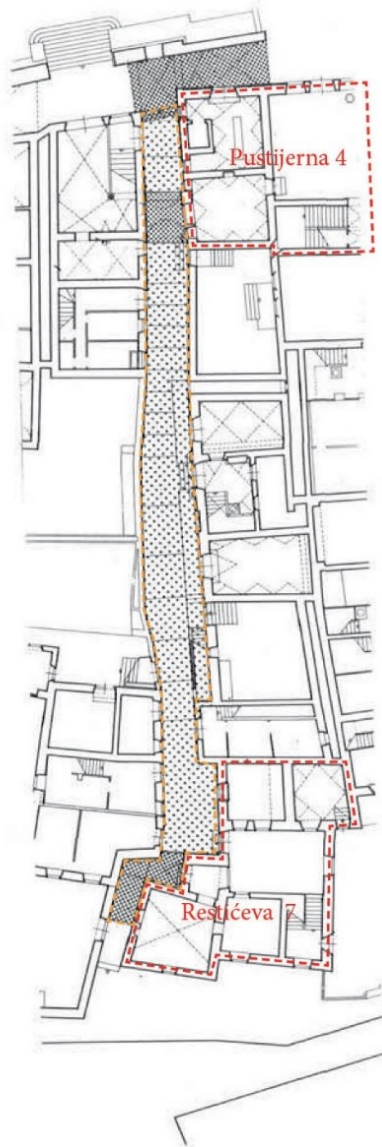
The ground floor of the rows of houses in Restićeva Street in Dubrovnik. Plans reconstructed by Ivan Tenšek.
